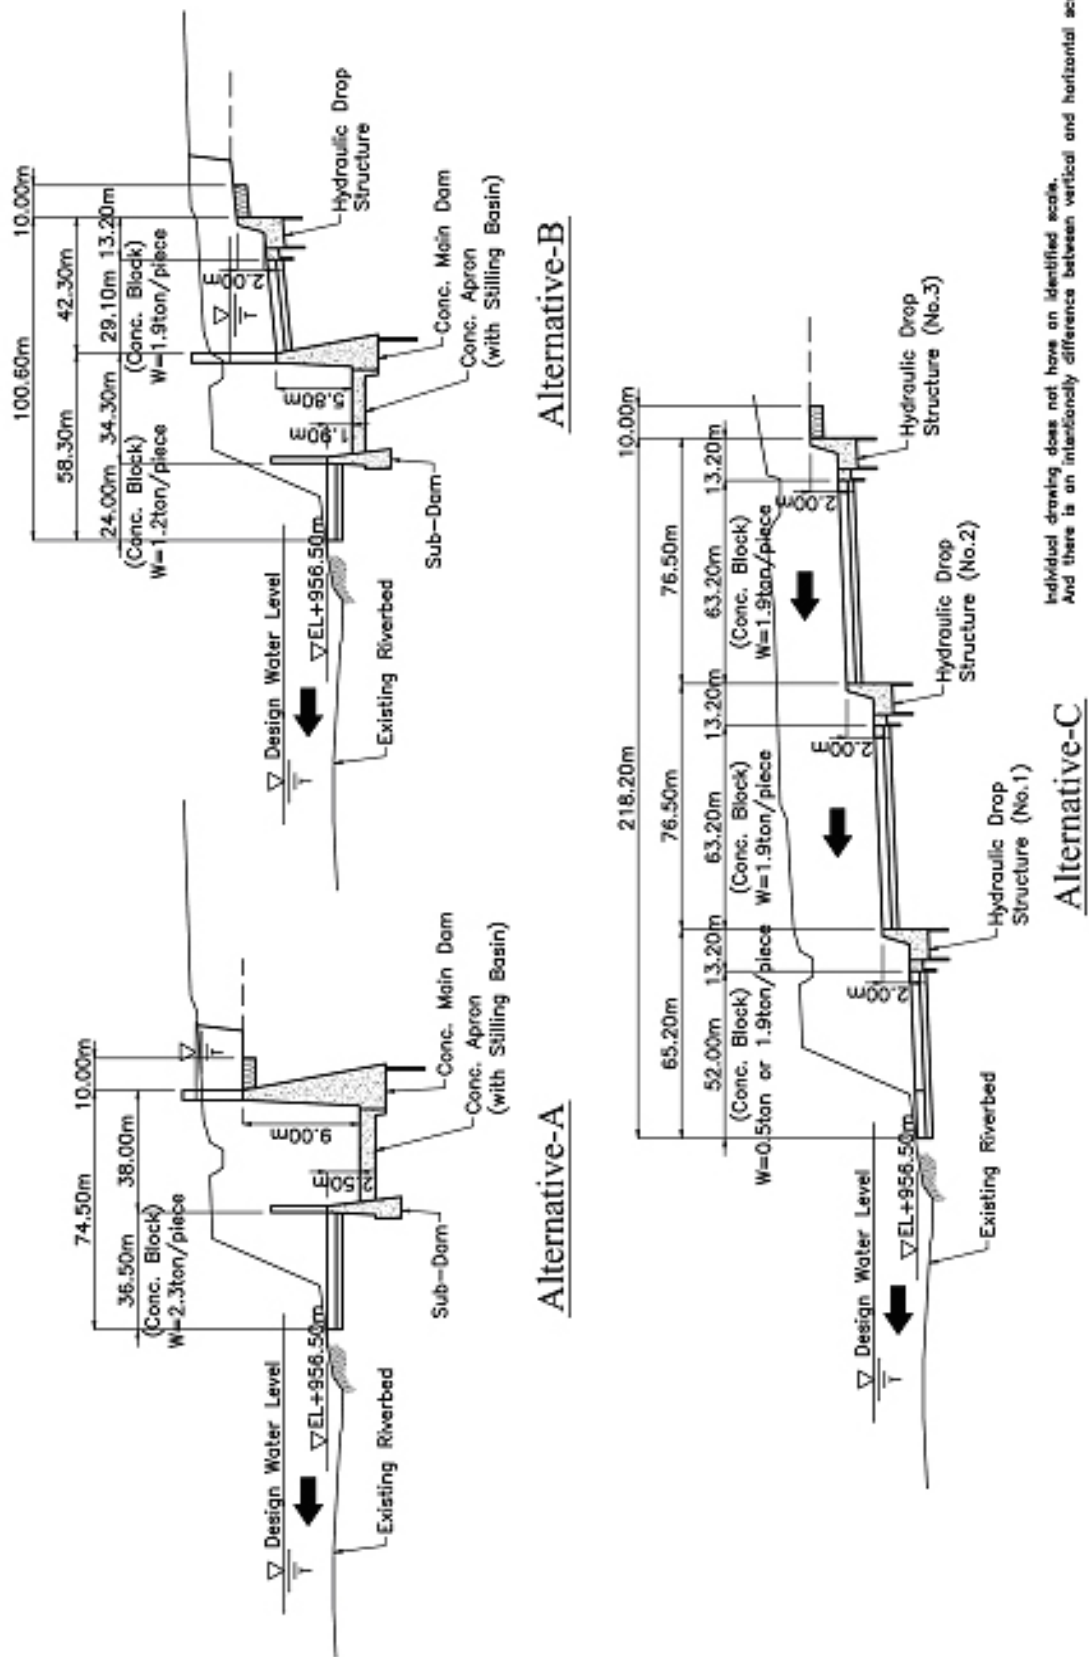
Schematic Drawings of Structural Alternatives for Riverbank Stabilization Works
